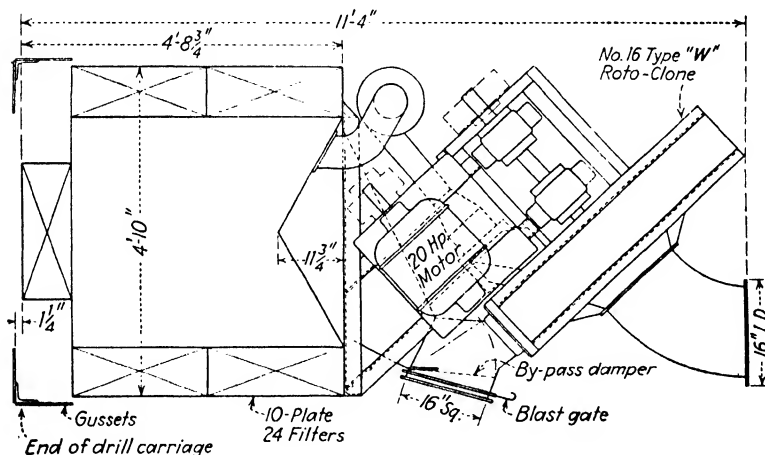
Later type of the auxiliary vent plant shown in Fig. 150. An exhaust fan and filters are mounted on the drill carriage. Dust is drawn from the drilling zone without creating drafts at the face. The dust-laden air is filtered and discharged into the heading behind the jumbo. (Courtesy of Kruse Engineering Co., Newark, N. J.)
